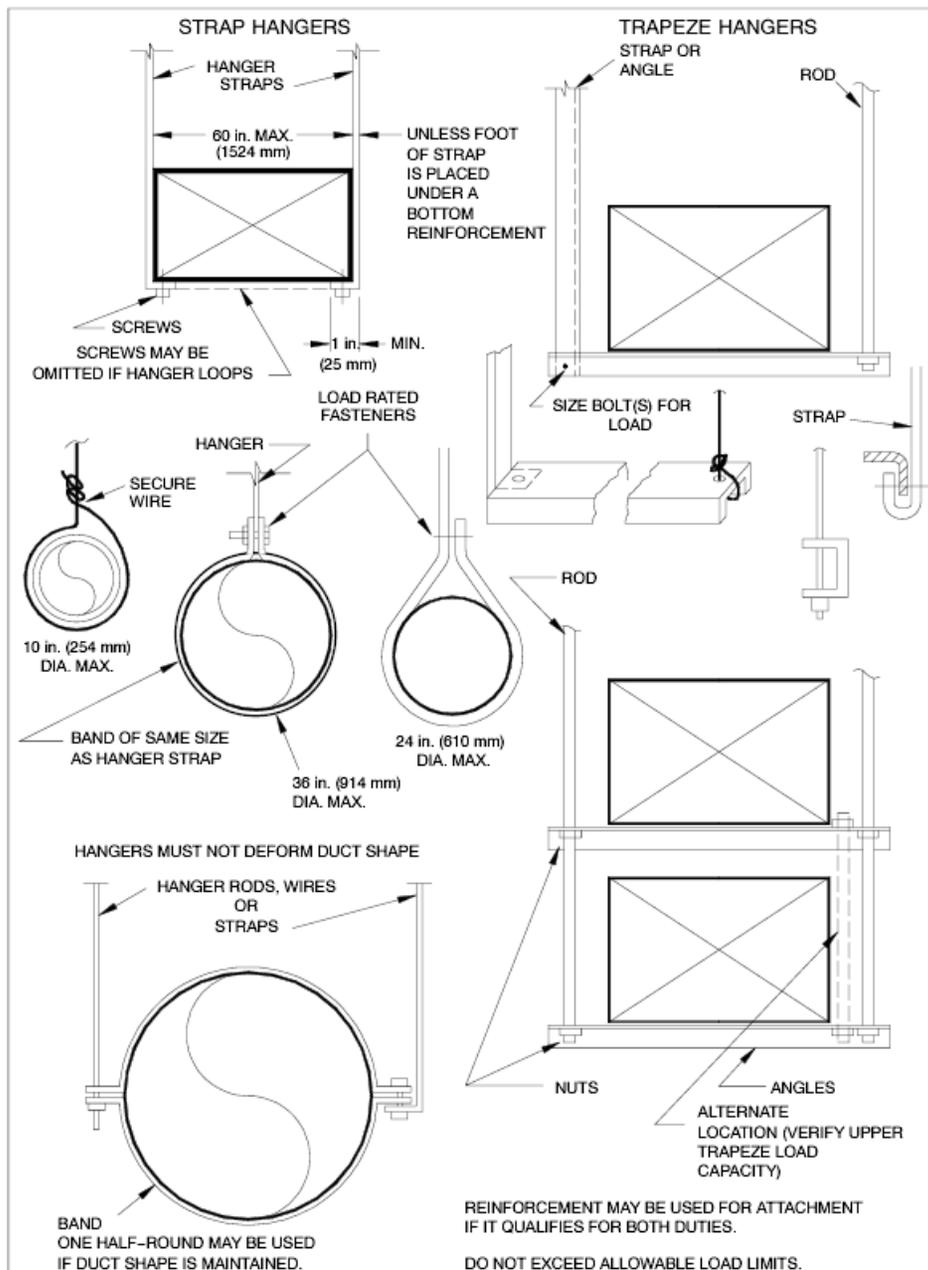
LOWER HANGER ATTACHMENTS
